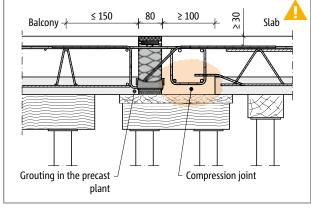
Schöck Isokorb® T type K/KF: Direct support, installation in conjunction with prefabricated slabs (here: $h \le 170 \text{ mm}$), compression joint on the floor side
